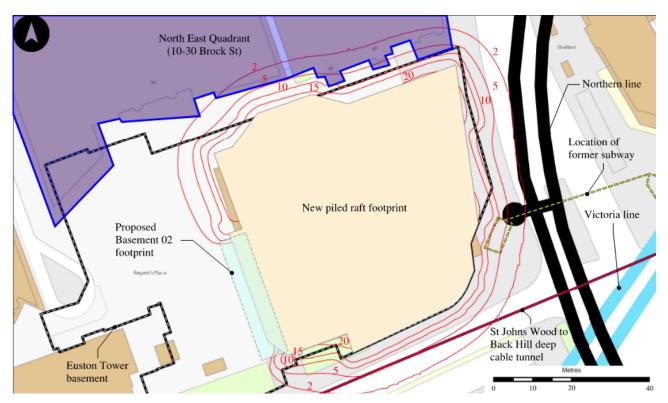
Calculated long term settlement (mm) at basement level +21.6mOD resulting from partial superstructure deconstruction, proposed Basement 02 excavation, and new superstructure loading.
